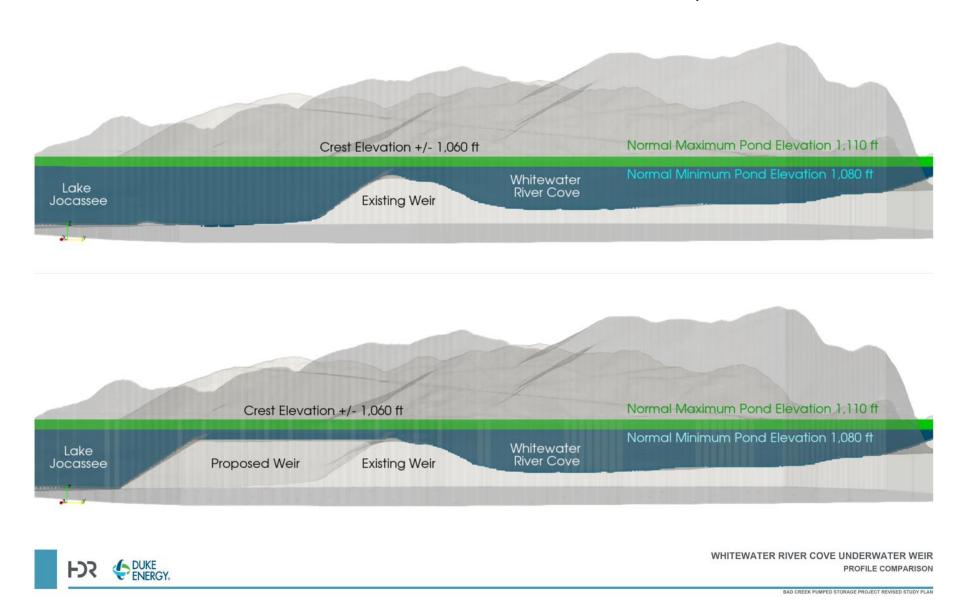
Submerged Weir in Whitewater River Cove (Existing and Proposed) – Cross Section View
